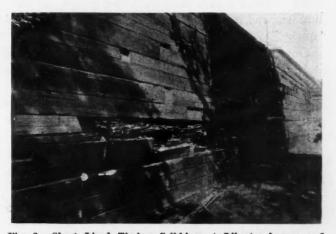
Short Lived Timber Cribbing at Liberty Avenue and Water Street, Pittsburgh, Replaced with Concrete Cribbing.
